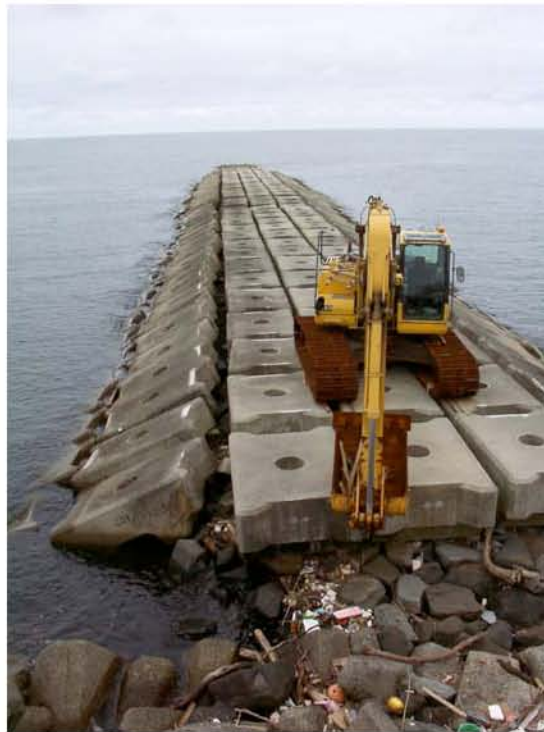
Repair of an armored, rockfill breakwater (possibly an outfall structure). (Location is southwest of Site SD1, photo taken 7/22/07 11:49).
